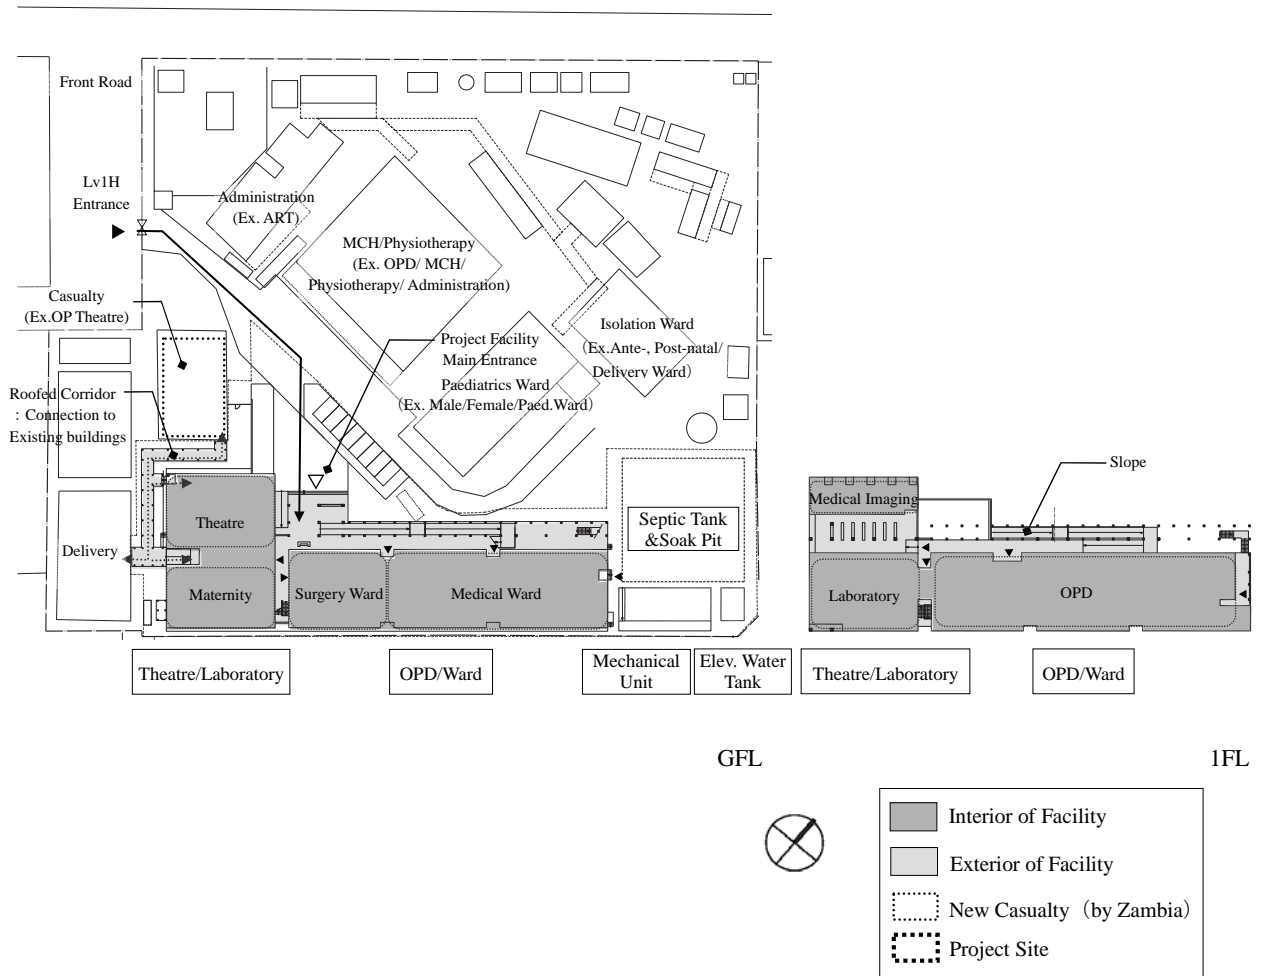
Kanyama Lv1H Facility Floor Planning
